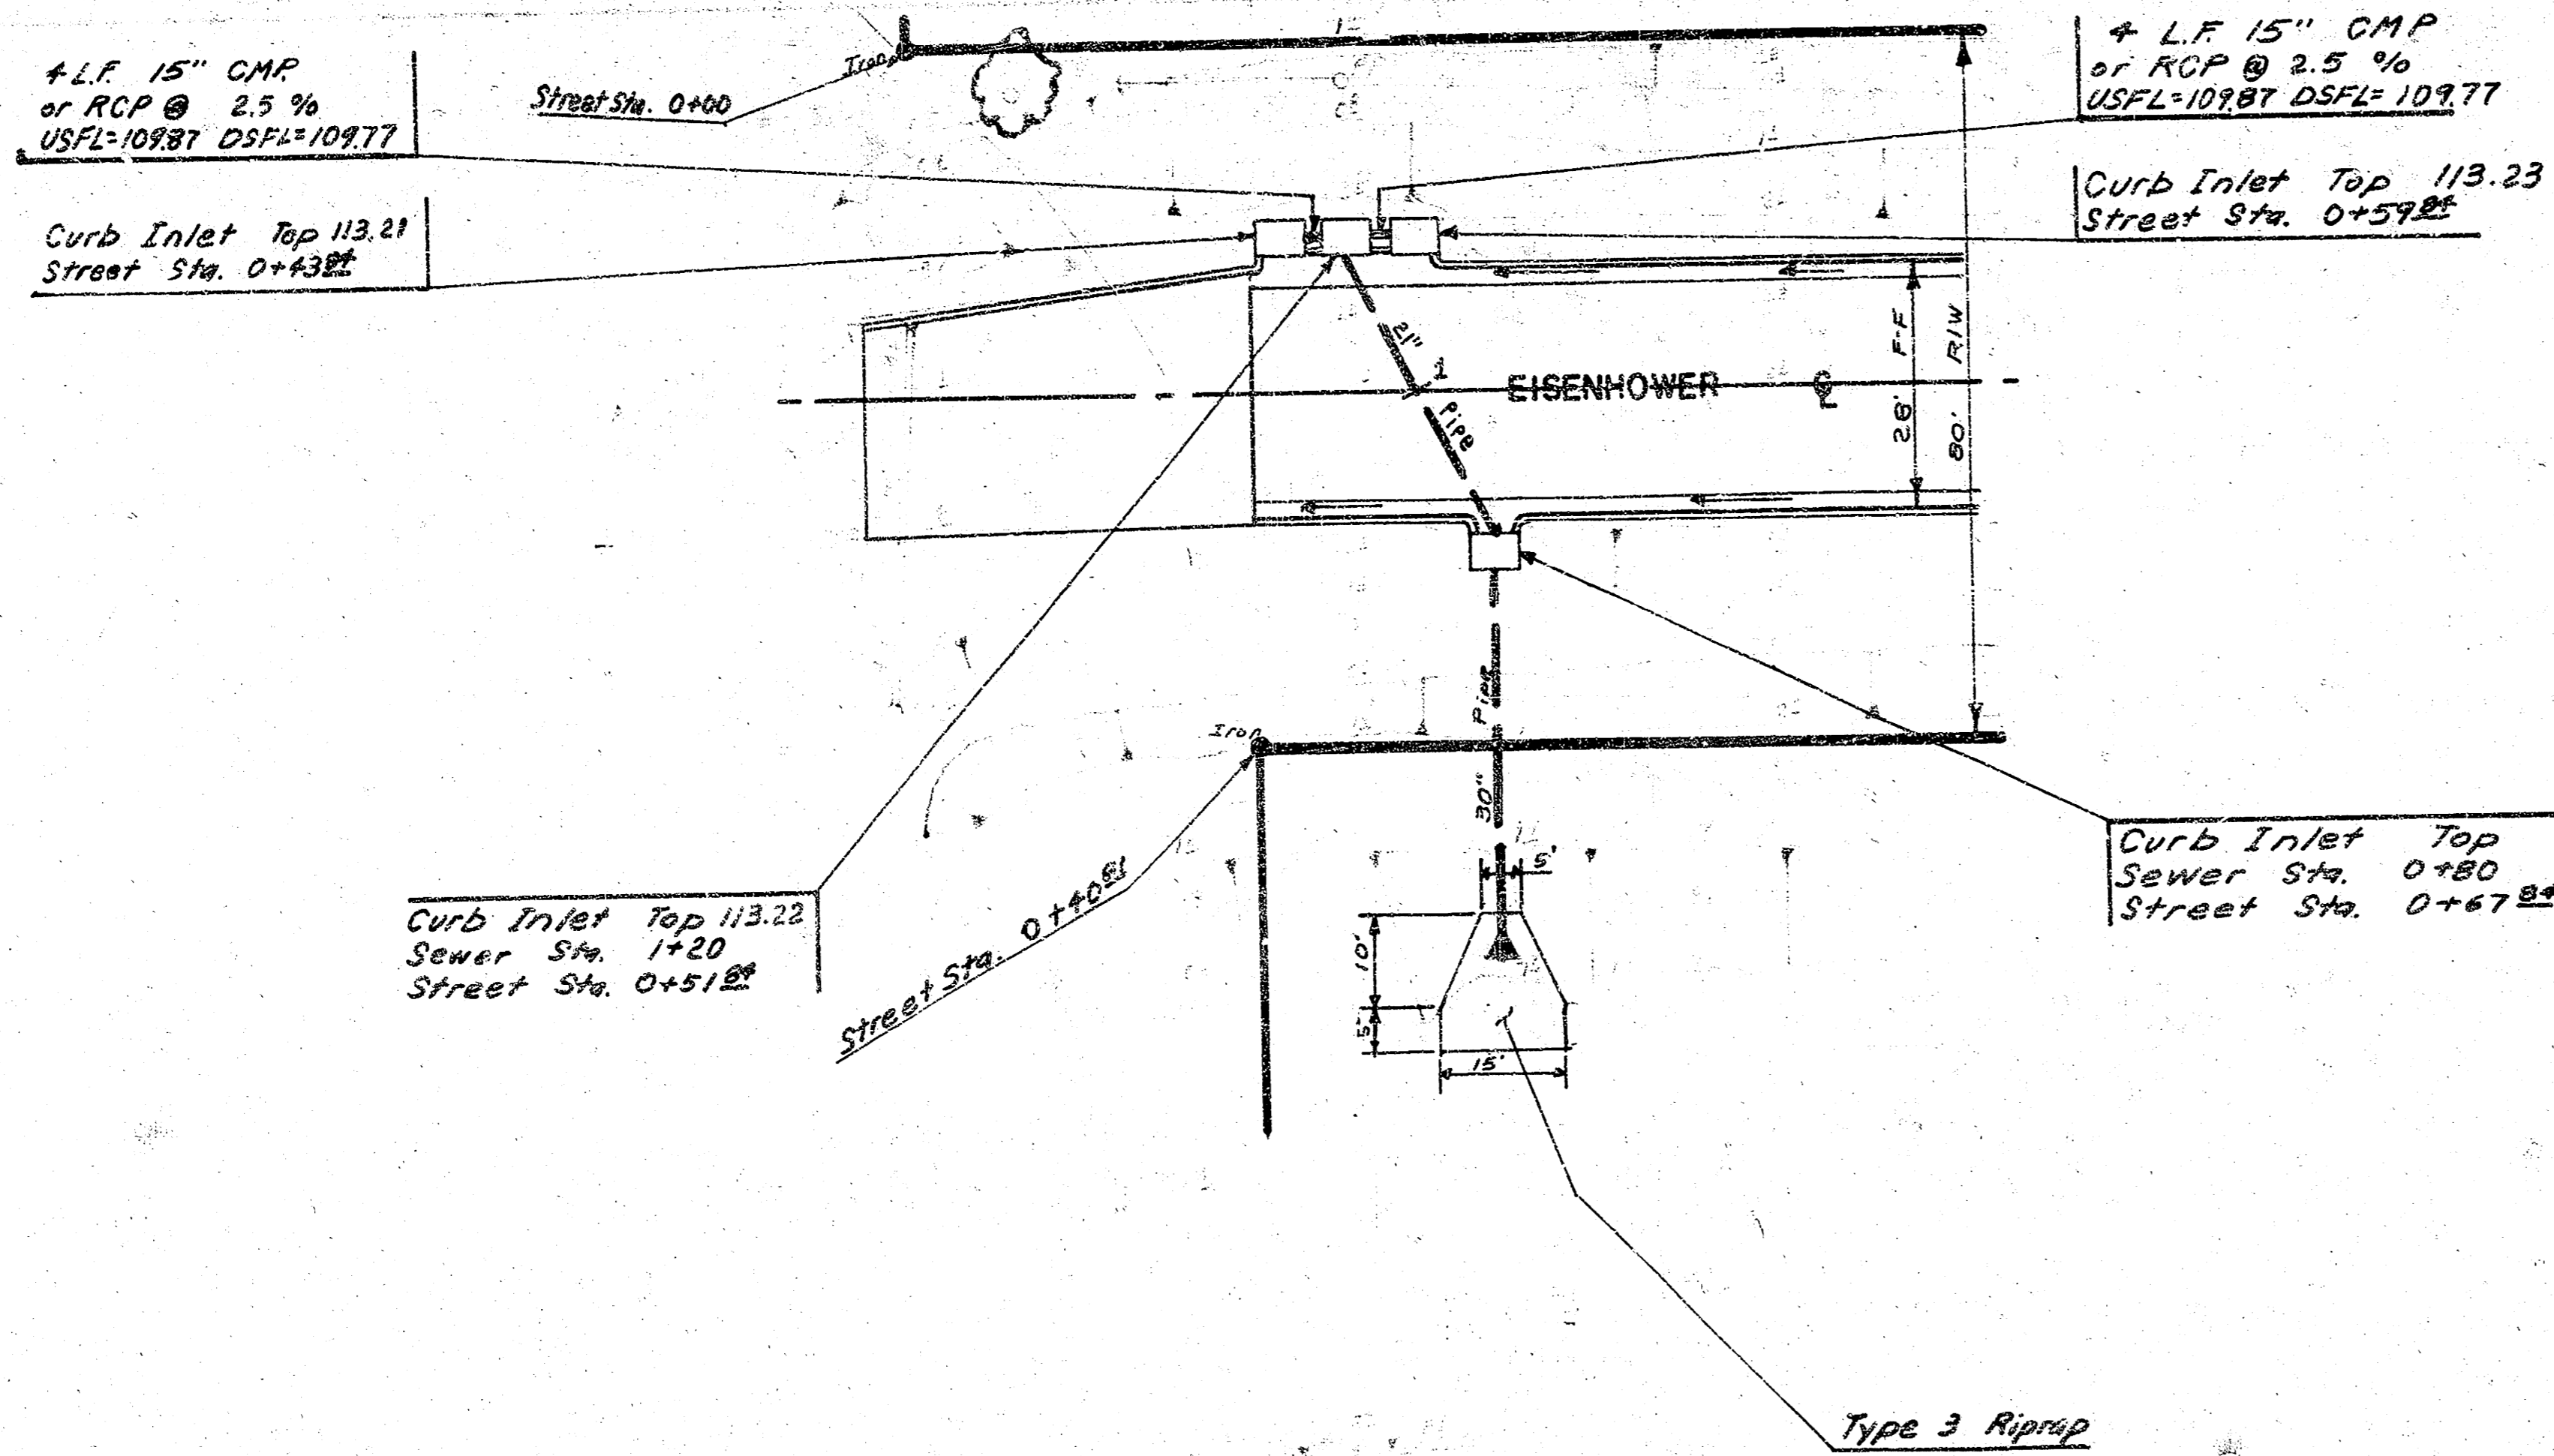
DETAIL: DRIVES WEST SIDE EISENHOWER BETWEEN
